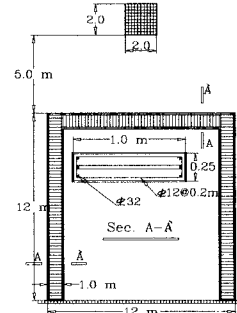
Shape, dimension and reinforcement details of an RC frame and a falling block
